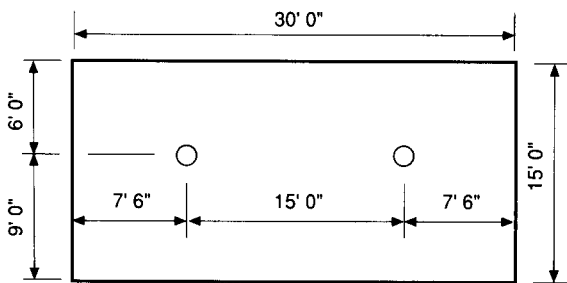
Layout of sprinklers under open wood joist construction—Ordinary Hazard Occupancies.
